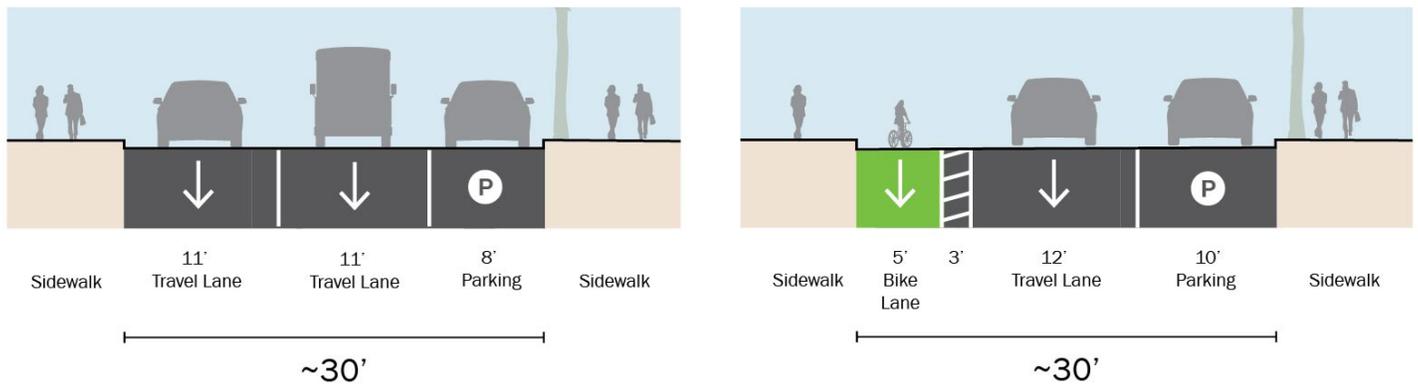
Existing and Recommended Cross Section of University Avenue (looking south)
